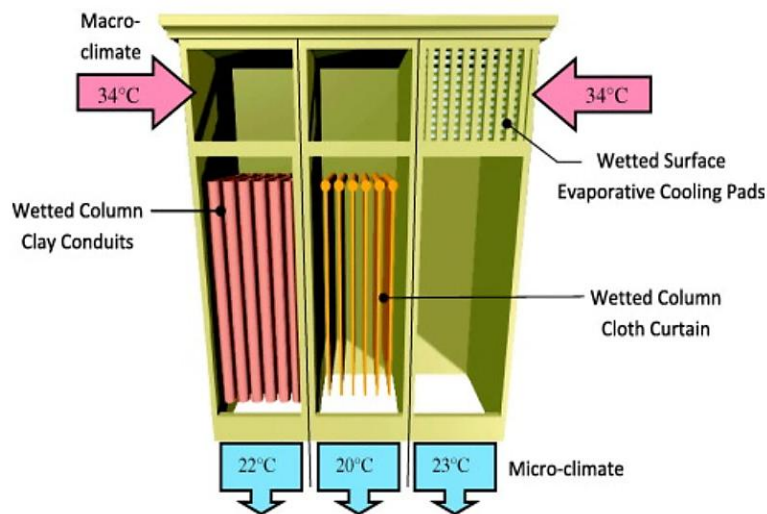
Cross-section of a wind tower with wetted conduits or columns [211], [212]
